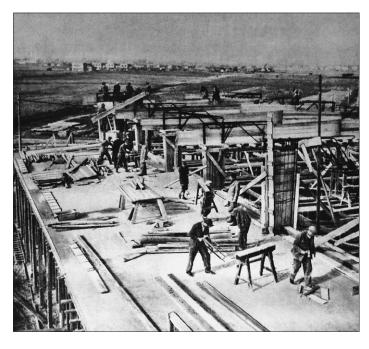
Construction works ON THE TECHNICAL CAMPUS
